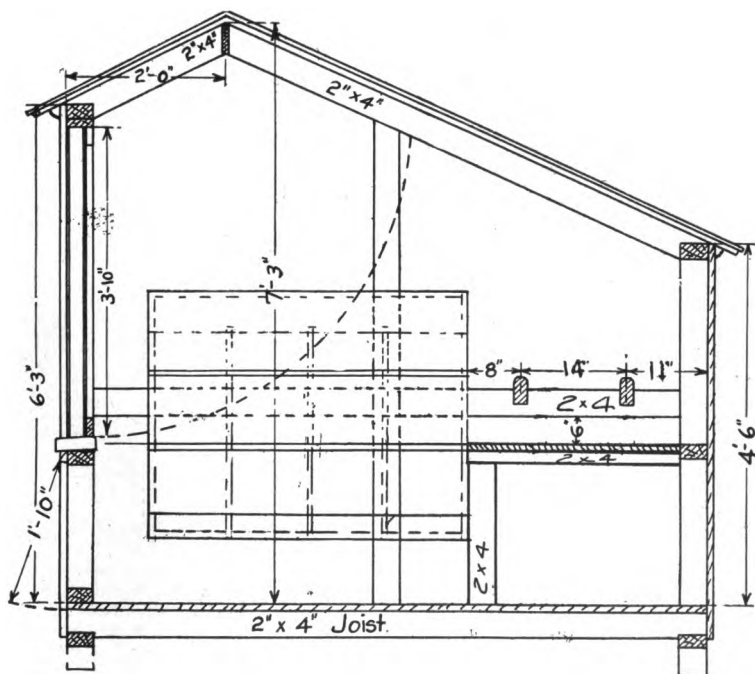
Cross section of the Iowa movable colony house showing the hinge and curtain frames and roosts.
